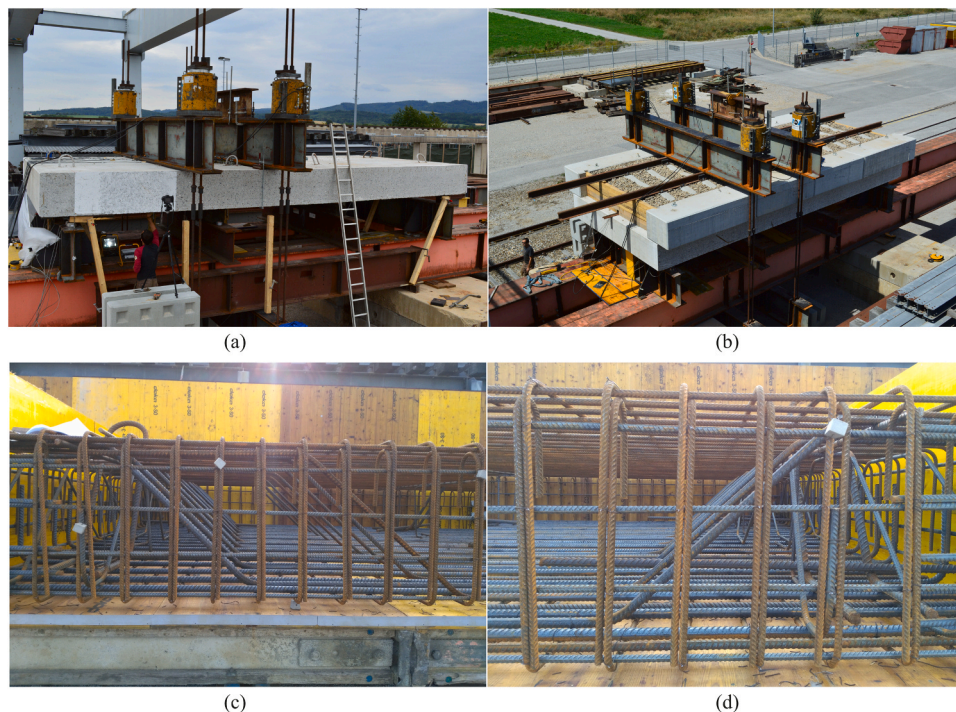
Full-scale testing: (a) slab without superstructure, (b) slab with superstructure, (c) two rows of bent-up bars and (d) a single row of bent-up bars.
